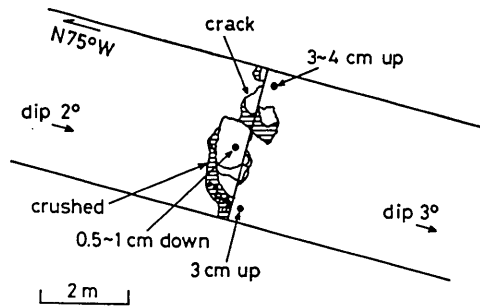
One of the two small pressure ridges appearing on a concrete pavement southwest of Takigoshi (Loc. a; see Fig. 28).
